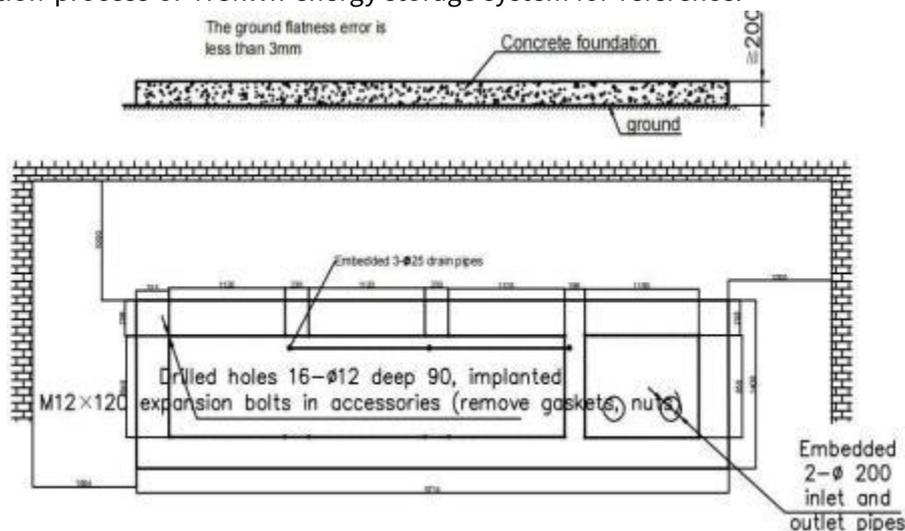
Foundation Construction 473kWh Energy Storage System
